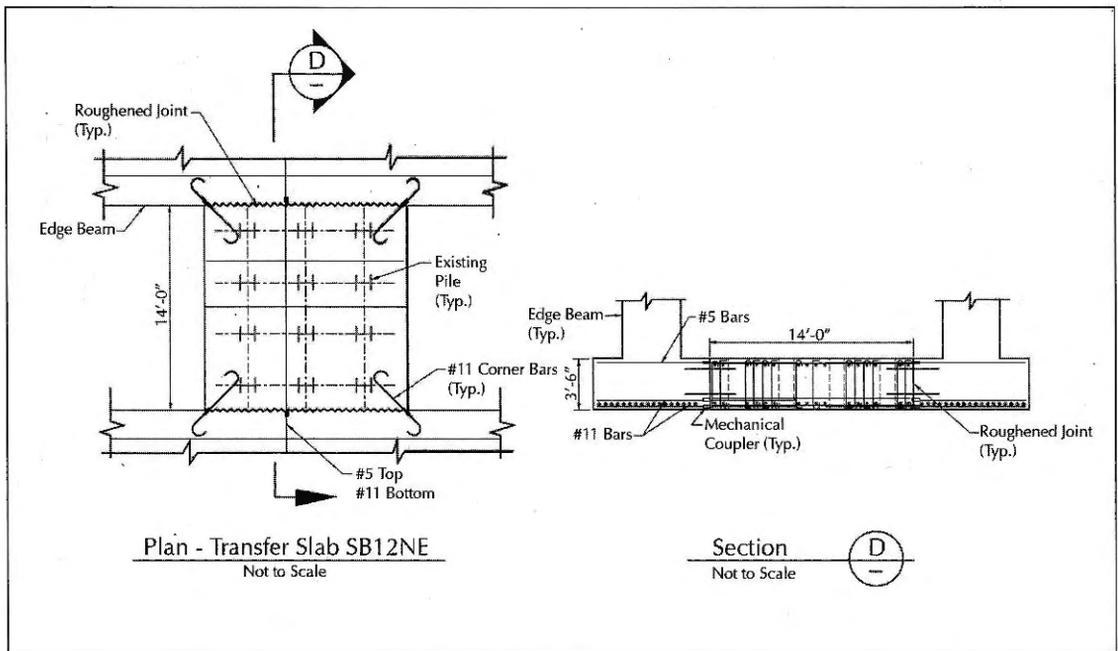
Typical underpinning transfer slab supporting the existing SR 0065 viaduct foundation.
